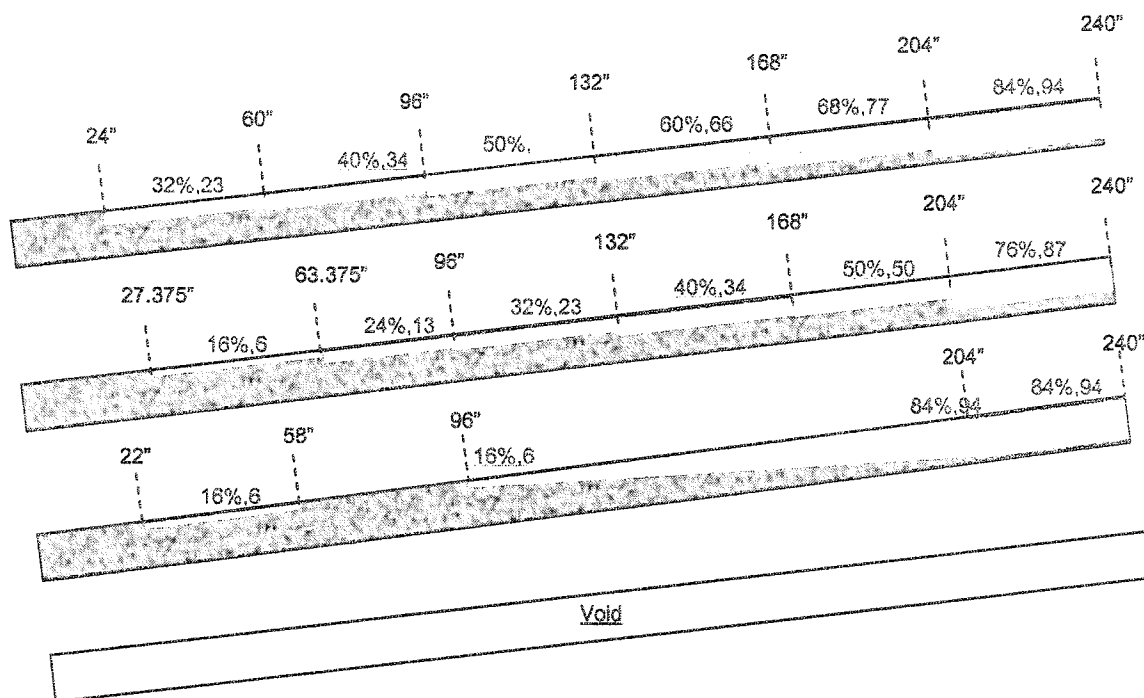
Design Grout Defects in the North Wall in 4 inch (101.6 mm) Metal Ducts
